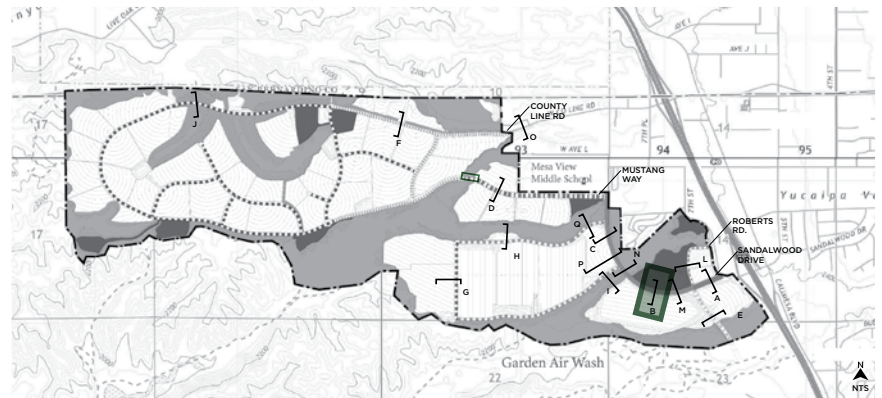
ENLARGEMENT MAJOR STREET SECTION B
